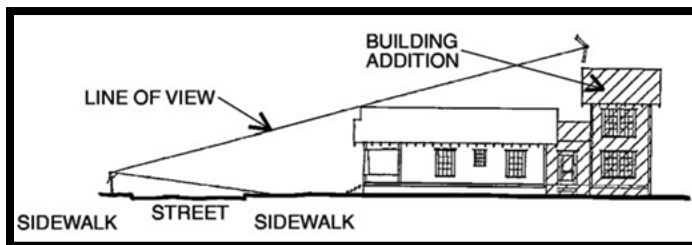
VERTICAL ADDITIONS WILL NOT BE VISIBLE TO A PERSON STANDING ACROSS THE STREET FROM THE BUILDING.
